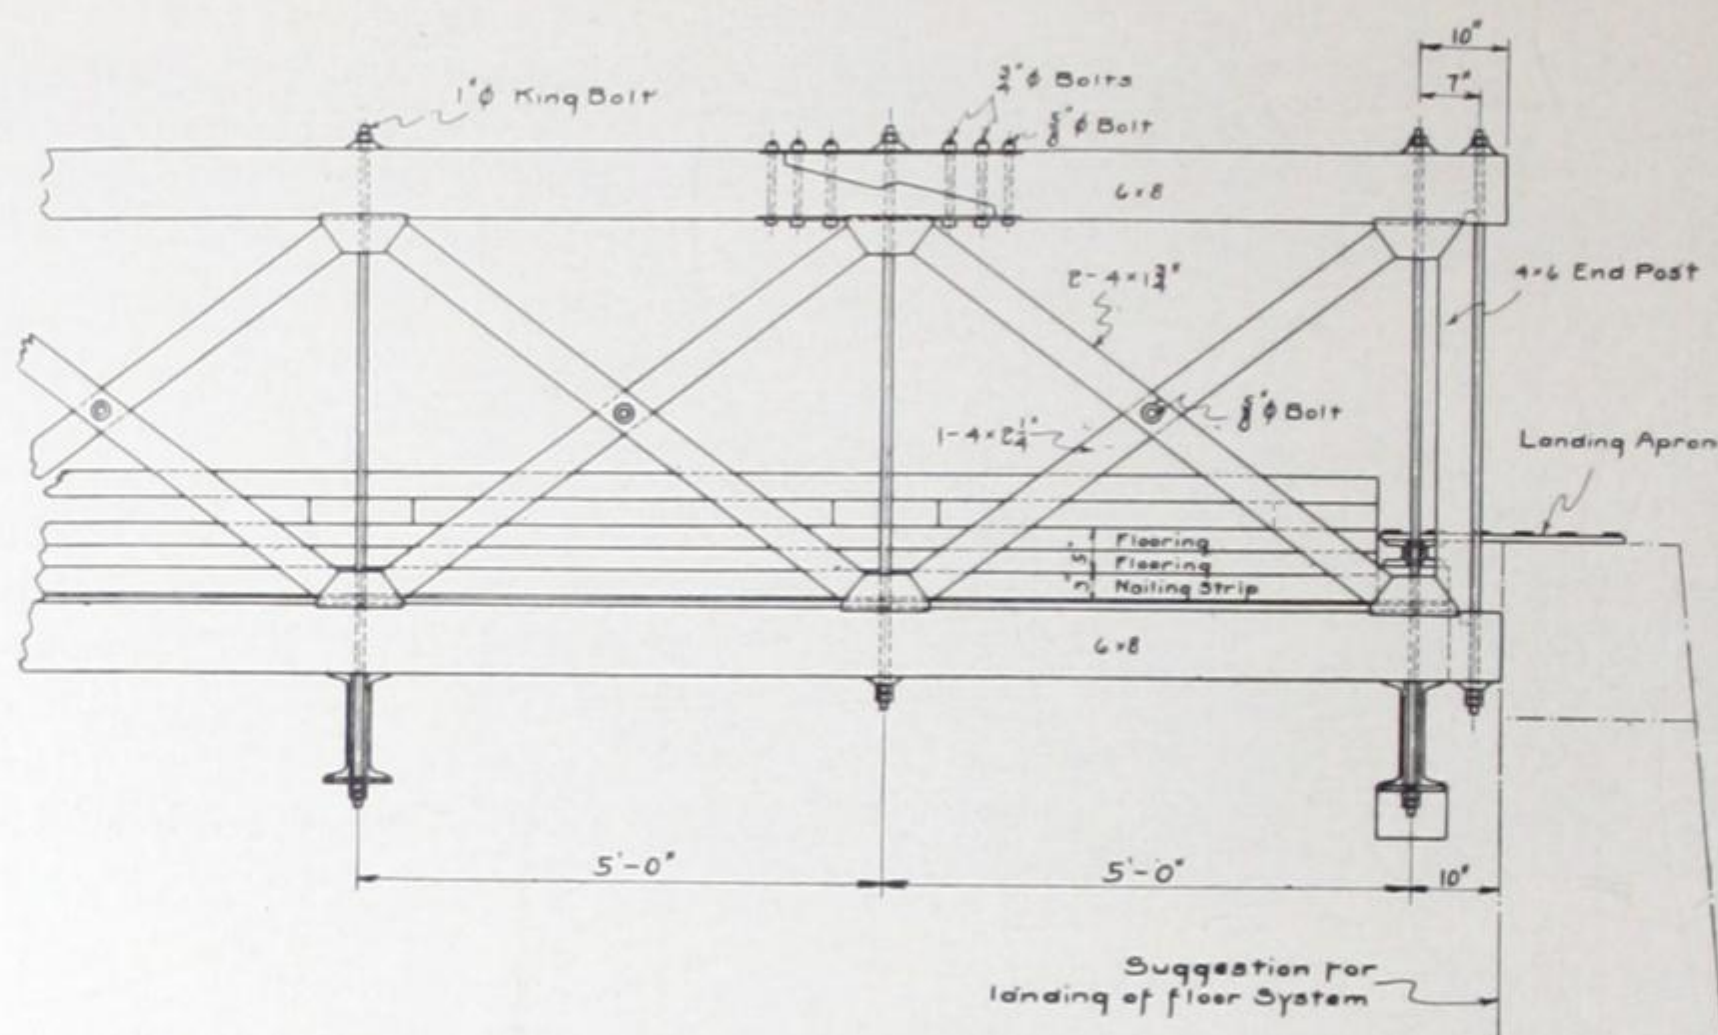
Elevation of truss. Note typical timber splice in upper chord.
